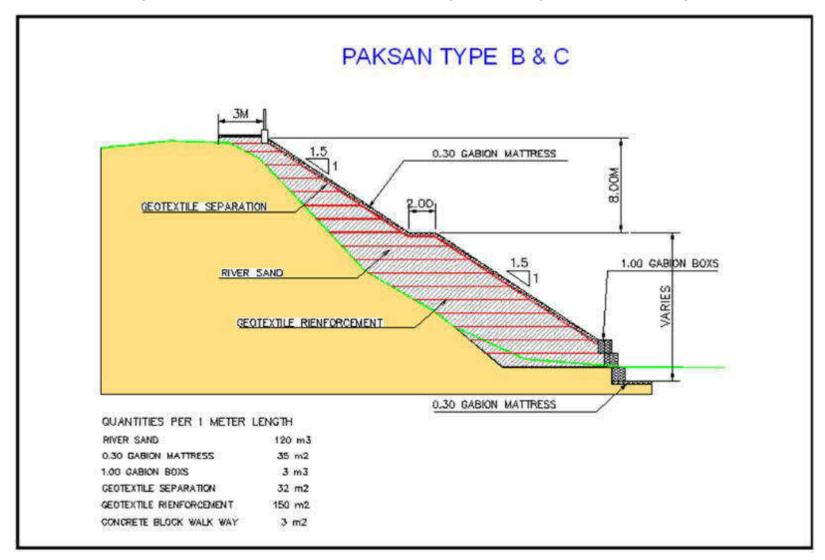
Cross section of Pakxan riverbank protection (upstream of road bridge)
